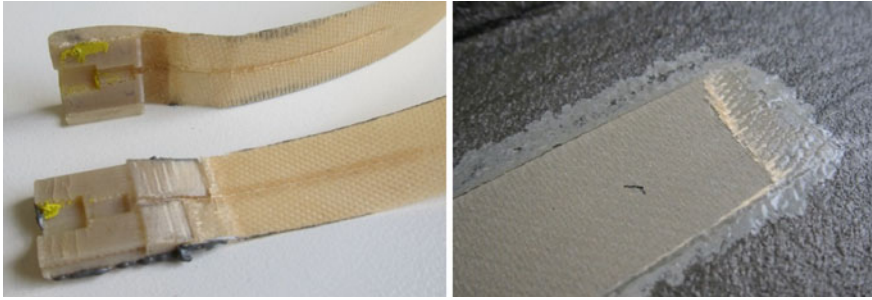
Removed ribbon tape (*left*) and resulting surface after removal
